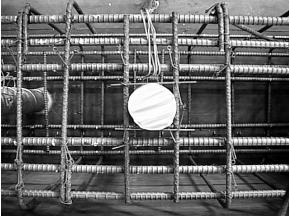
Grouted Vertical Duct Rebar Cage and Ducts
